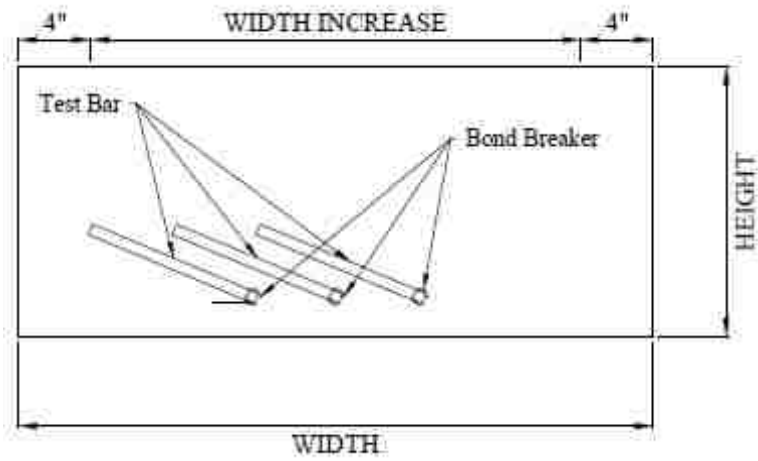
90 degree hook, 22.5 degree tilt, 0.5 A spacing, multiple bar specimen
